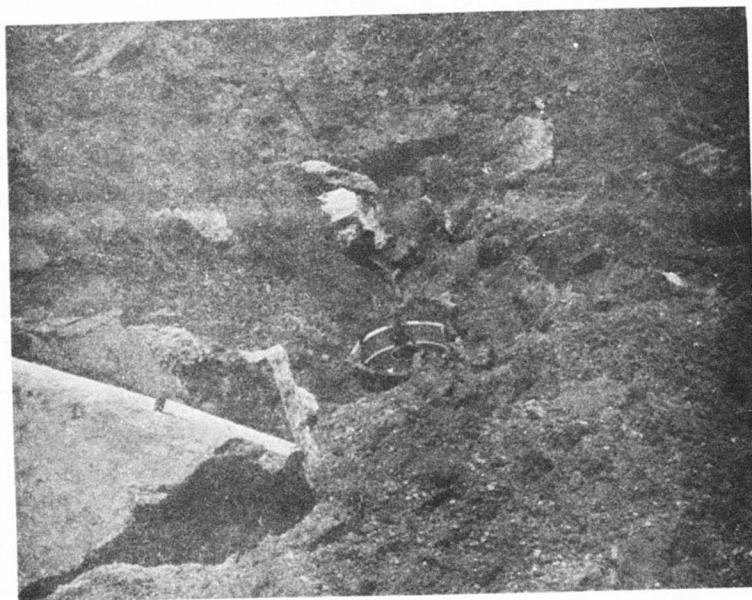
C. Test 1-2, Backfilling Procedure Utilizing Cylinder to Form Column for Sensors
